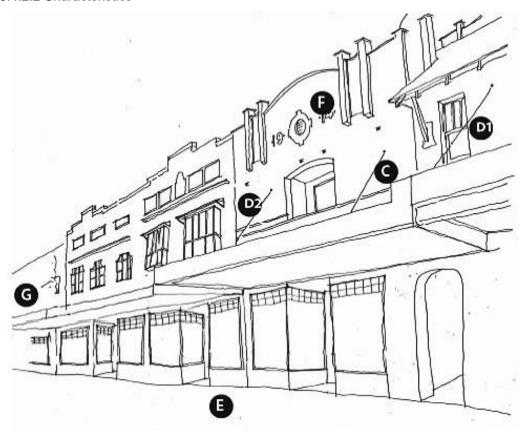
Primary defining elements of a heritage shopfronts including: C) recessed balconies; D1) window patterns, proportions and details; D2) bay windows; E) shopfronts; F) parapets profiles and details; and G) awning alignment, stays, fascias and soffits (Source: Marrickville DCP 2011, Part 5 - Commercial and Mixed-use Development, p.34)
